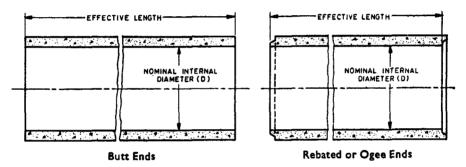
TYPICAL SKETCH OF CONCRETE POROUS PIPF FOR UNDER DRAINAGE
